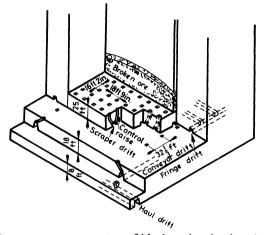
Scraper-conveyor system of block caving developed to extract ore which bottomed close to the haulage level, Miami Mine.⁽⁴⁾
